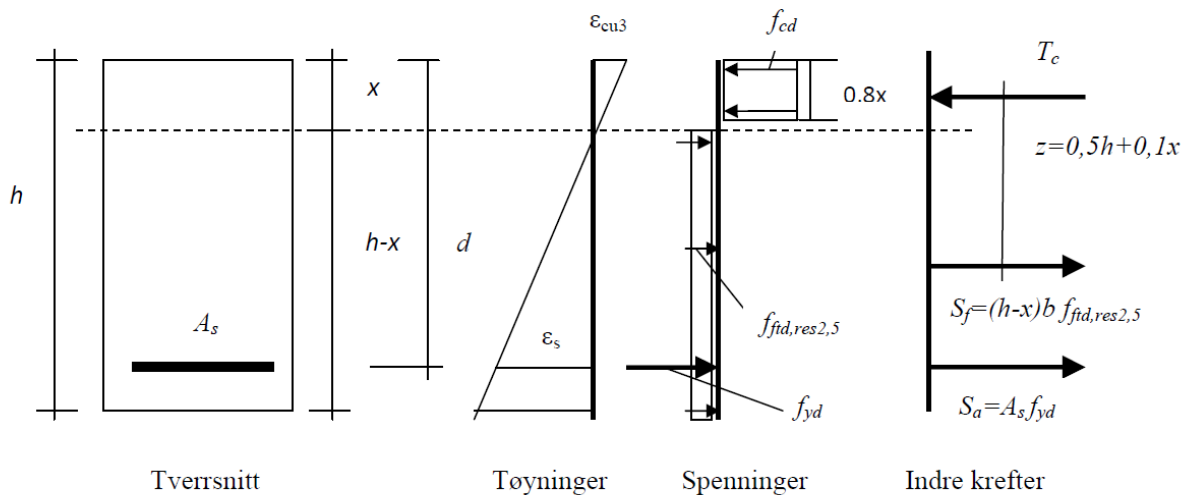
Stress- and strain distribution for a rectangular cross section of reinforced fibre concrete exposed to pure bending [6].
